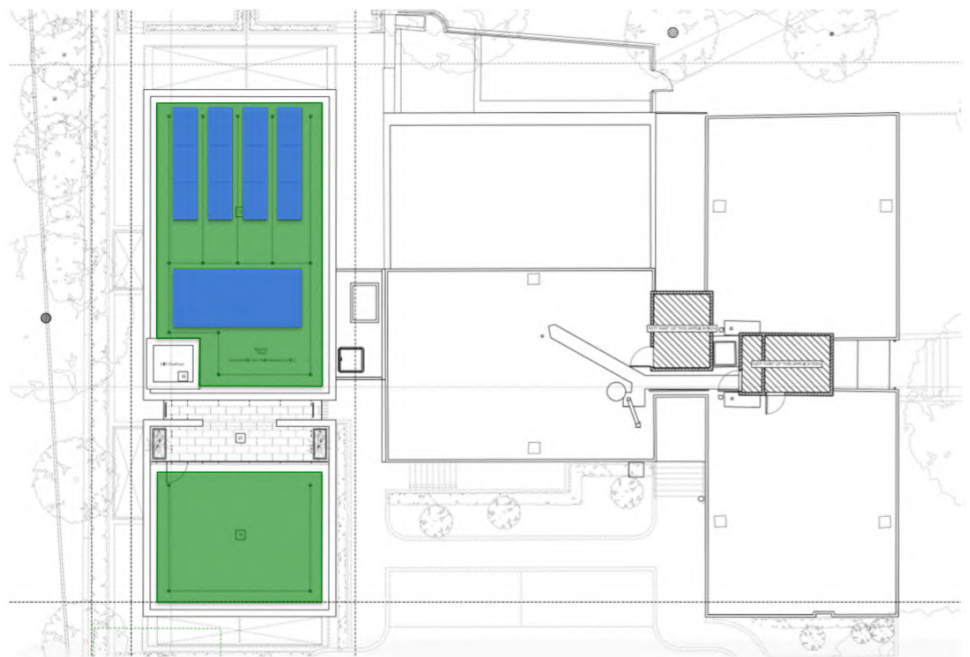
Potential green roof areas (marked green) and areas with areas required for building plant infrastructure (marked blue)
